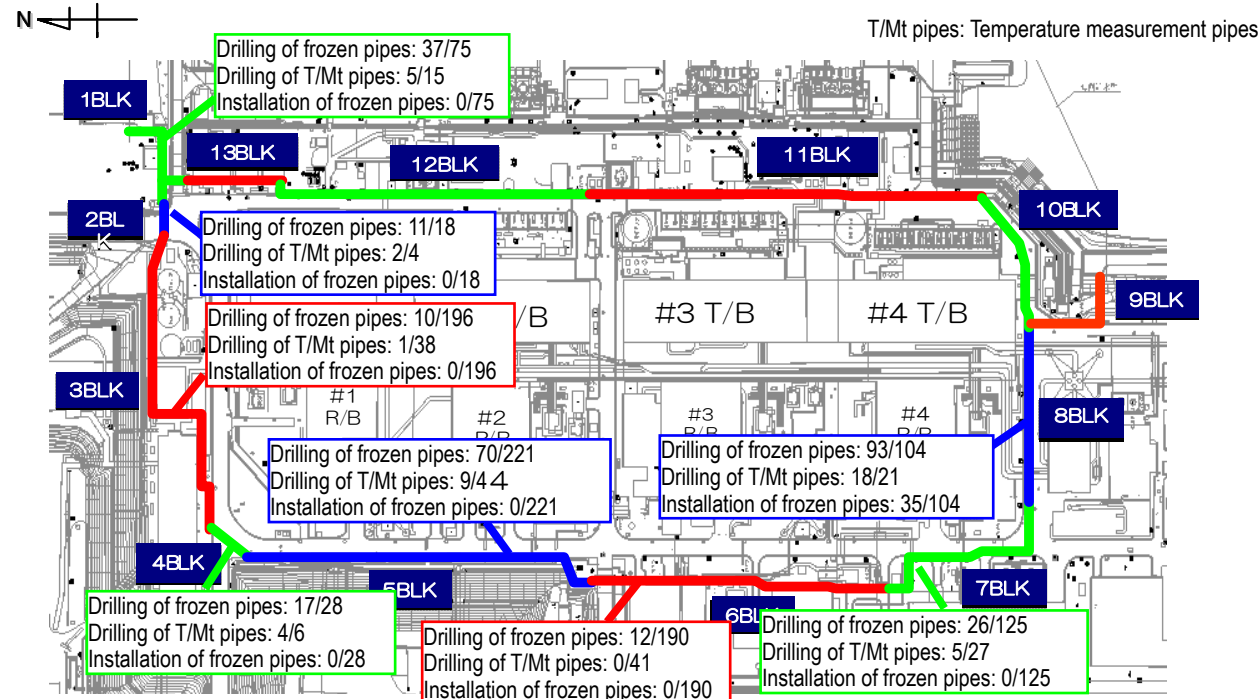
Status of drilling for frozen-soil impermeable walls and installation of frozen pipes
